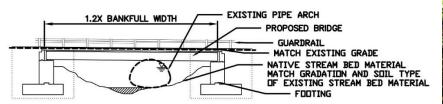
Typical detail of a bridge designed to meet the MA River and Stream Crossing Standards
